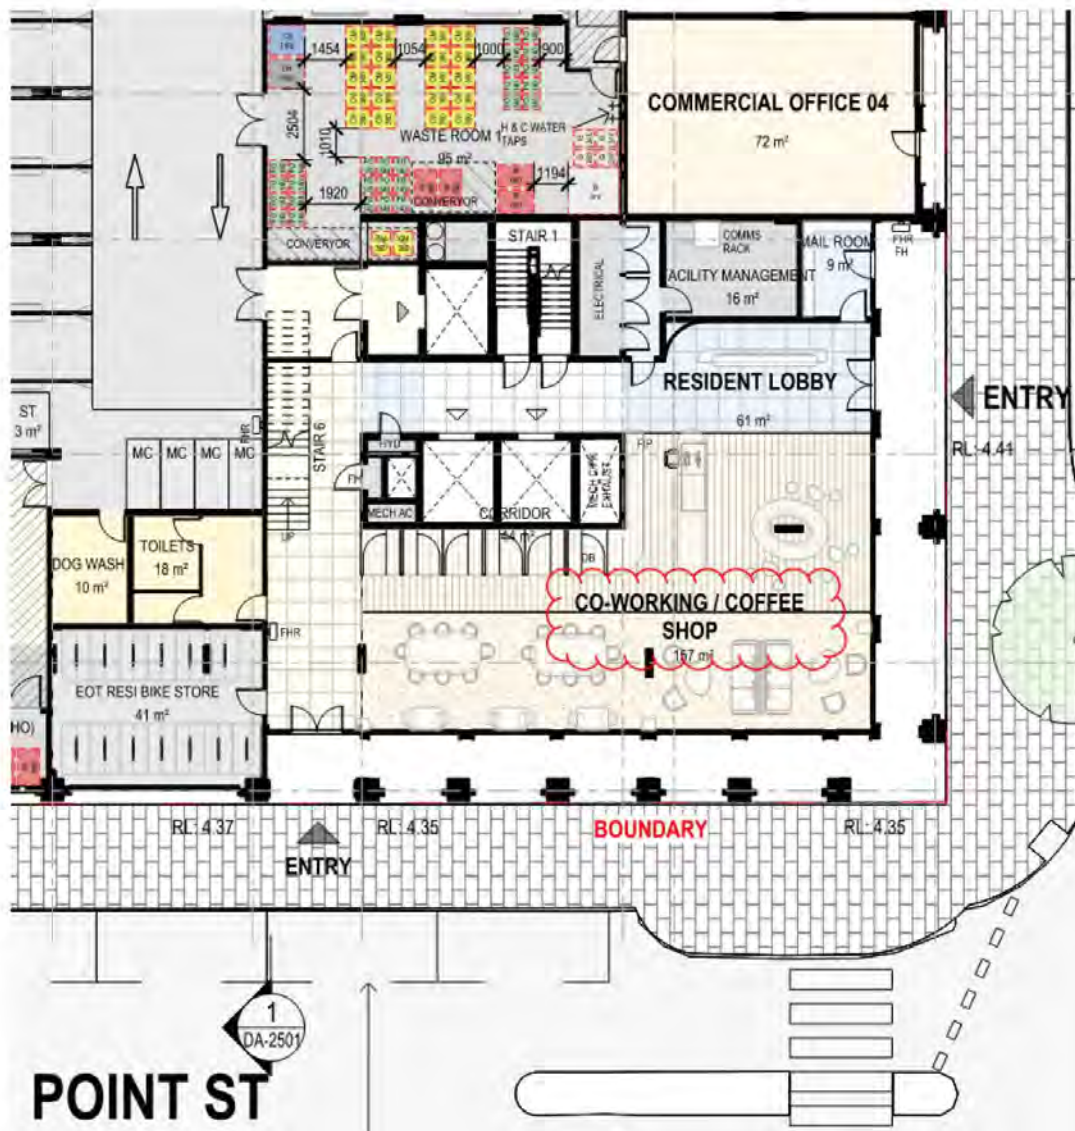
Ground floor Co-working/Coffee Shop tenancy location
